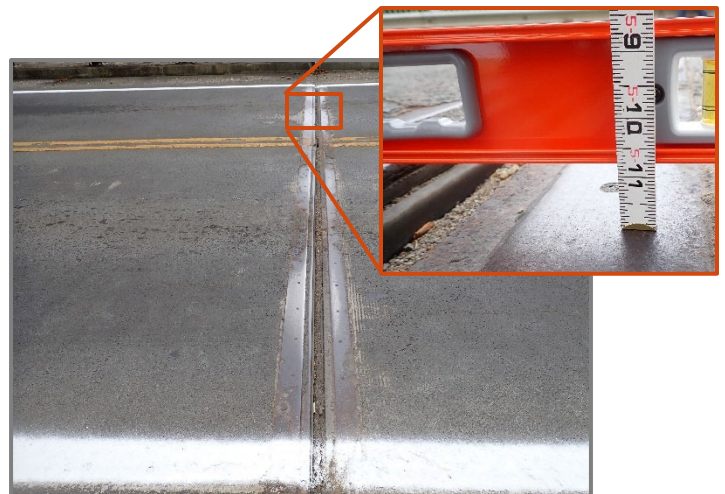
Up to 1 1/4" vertical misalignment between joint sections on either side of the Pier 2 joint in the westbound lane, looking south. Note forward side of joint is higher.
